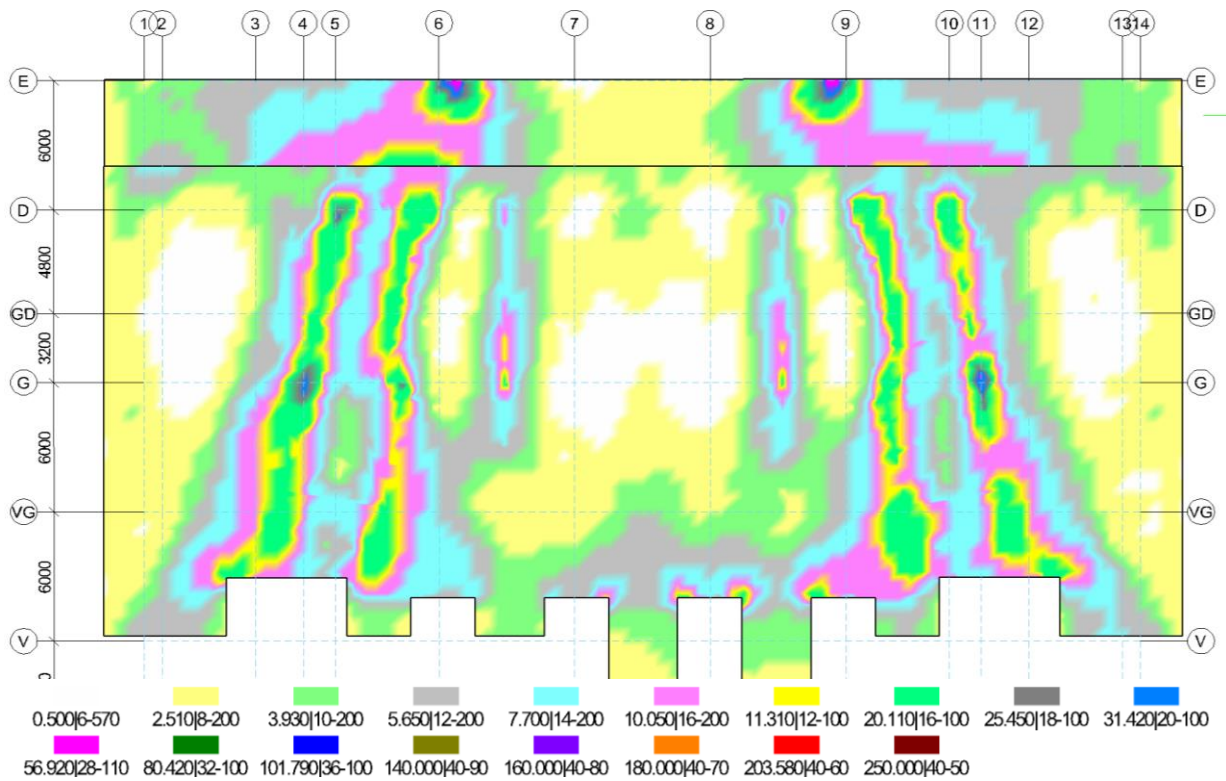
Reinforcement of the foundation. Lower longitudinal reinforcement in the direction of the axis S, cm^2/m [14]
